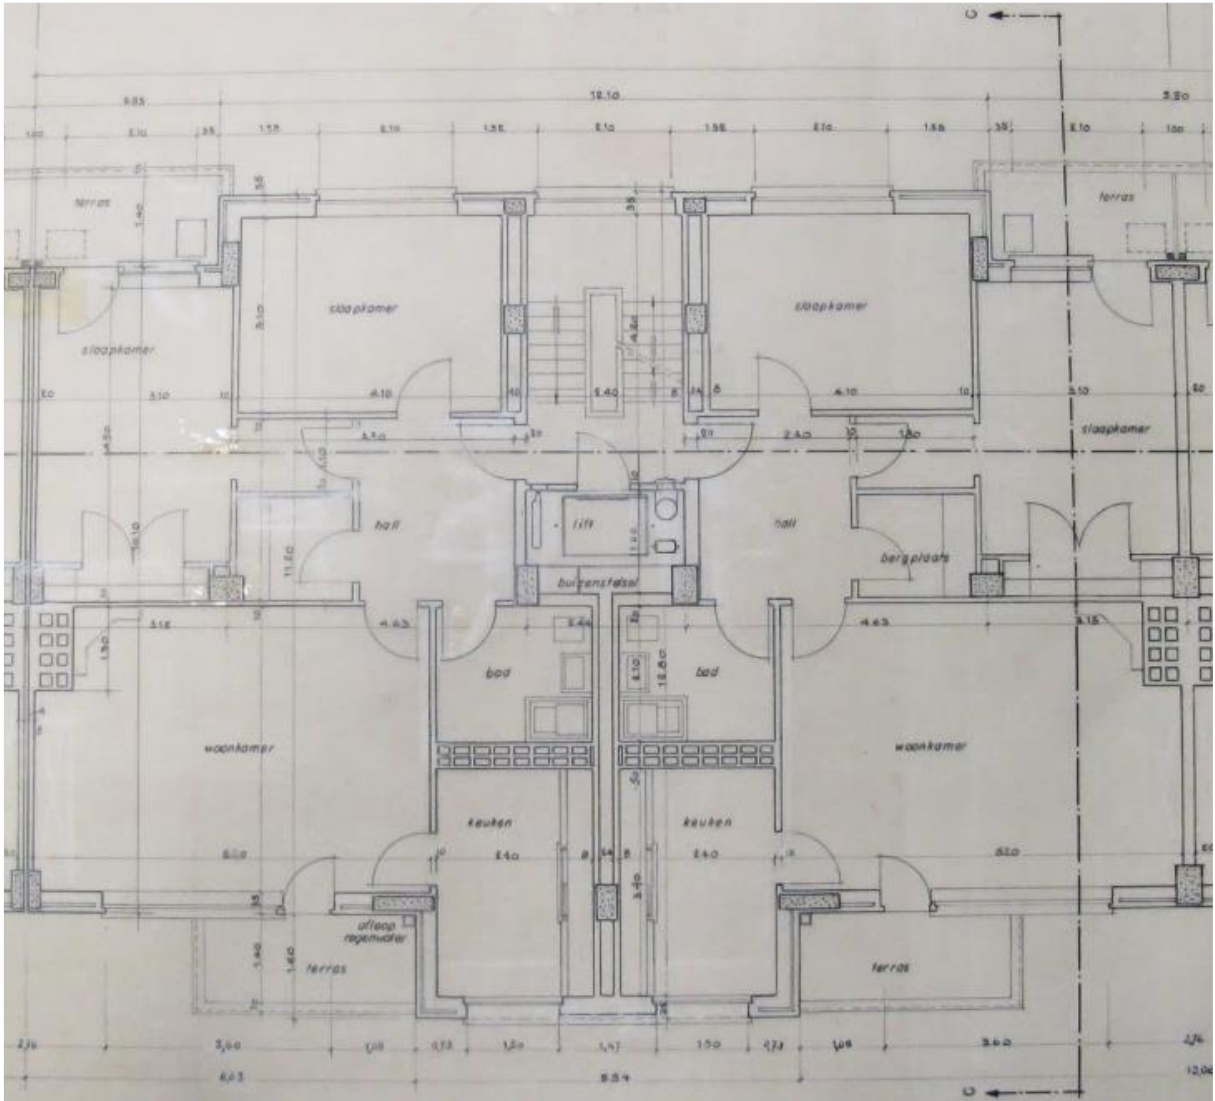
Plan of two apartments clustered around a combined elevator and stair shaft in Long Block B4 (City Archive Antwerp)
